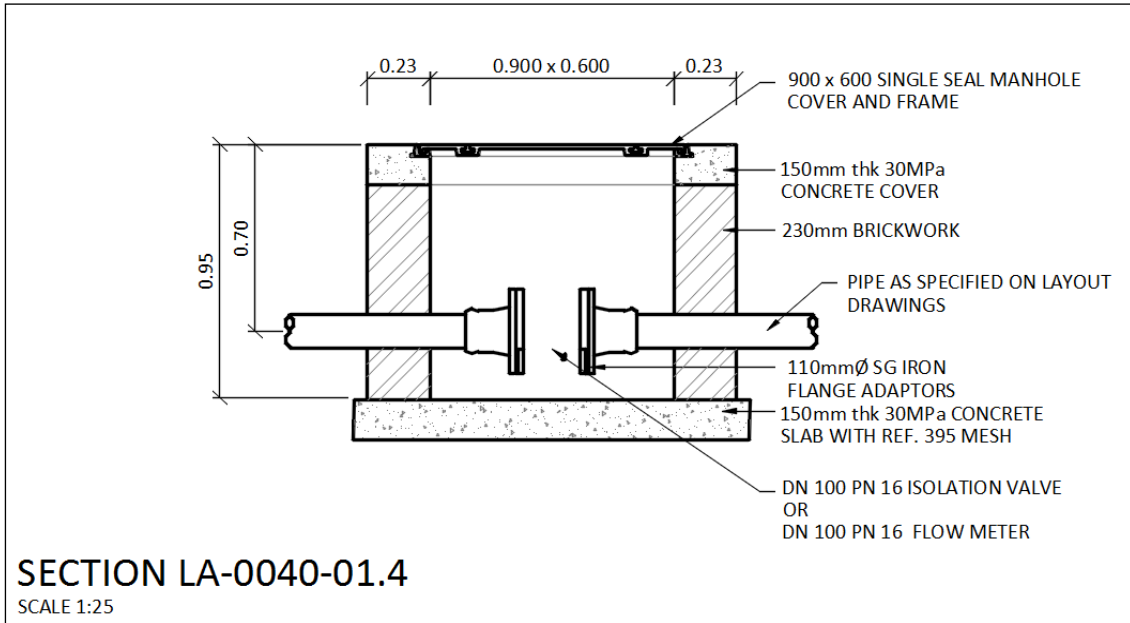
Typical Valve/Flow Meter Manhole Chamber Detail
